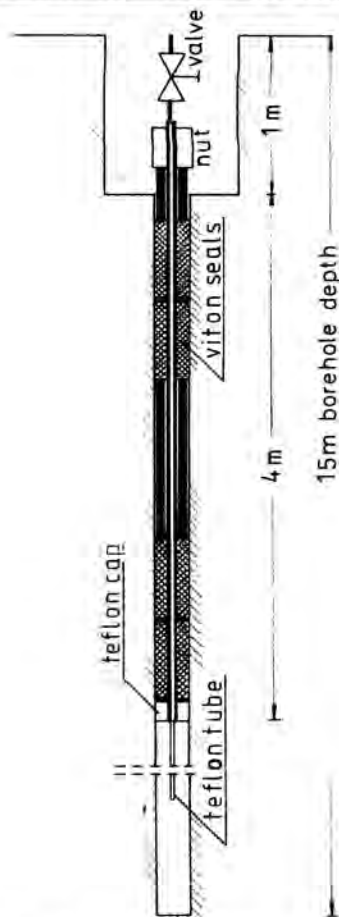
Principal Drawing of a Mechanically Expanded Packer.
